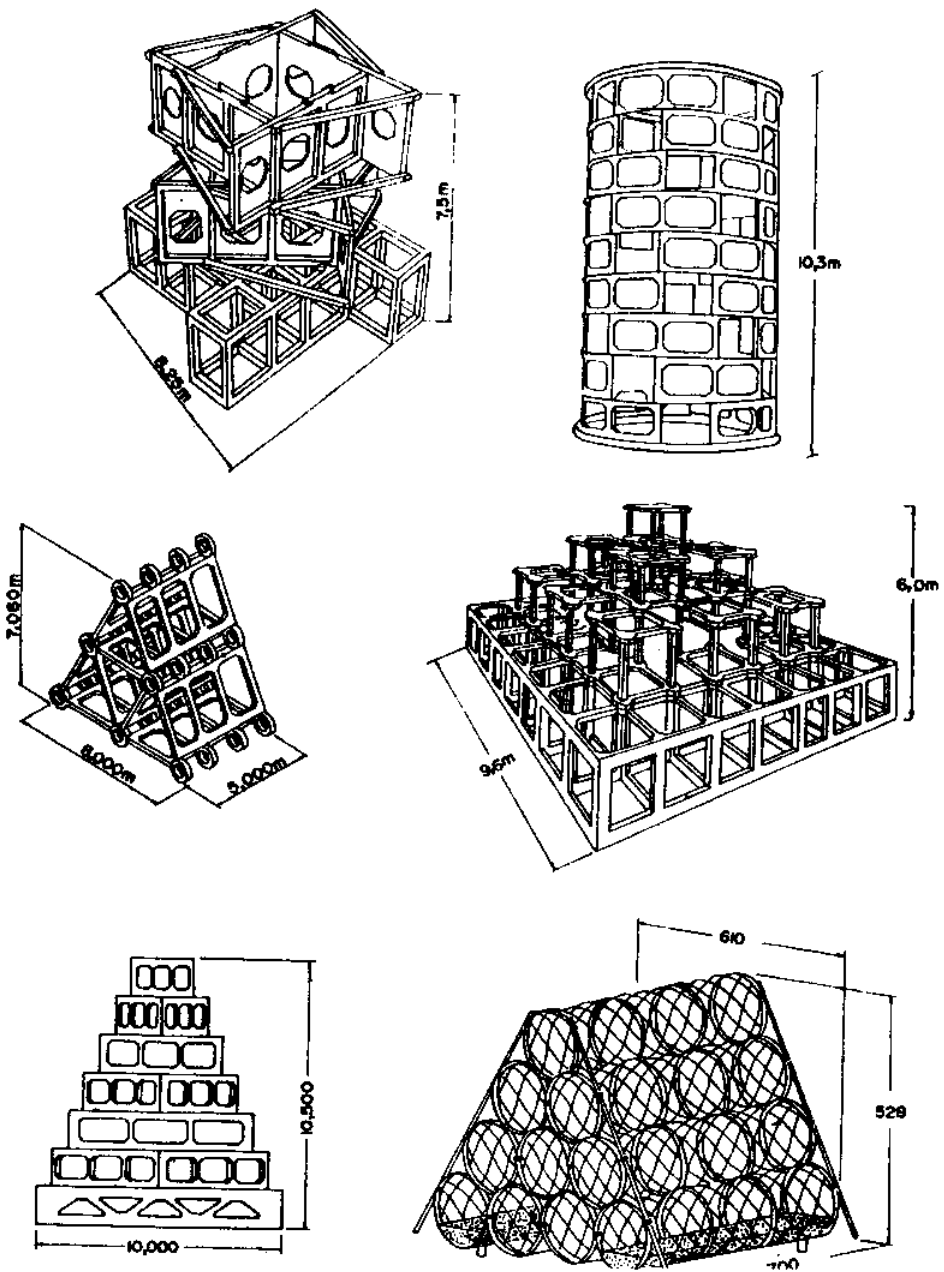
Concrete and plastic structures currently used in Japan for the construction of artificial reefs.
